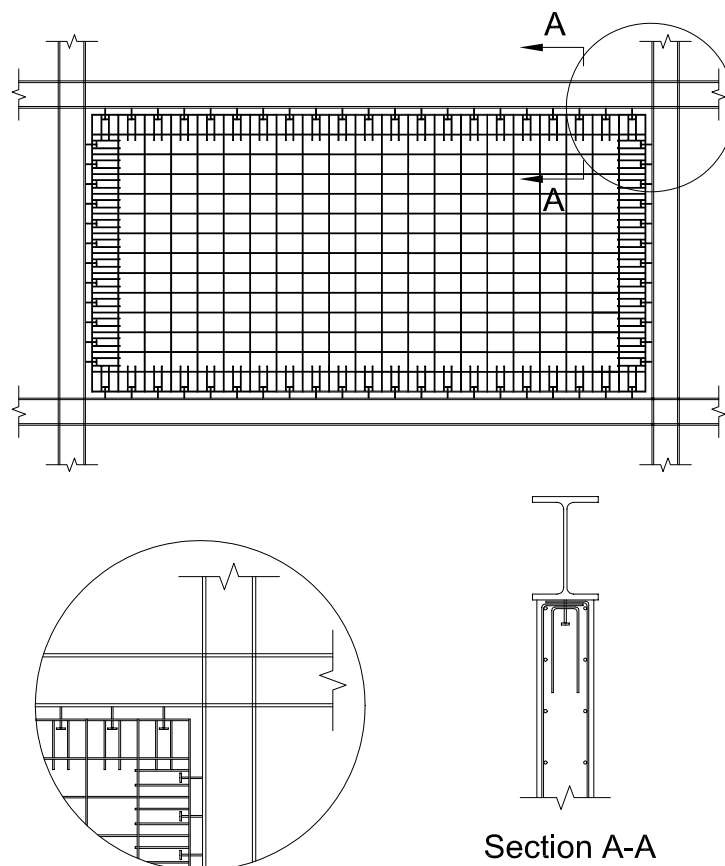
Typical reinforcement detailing in a composite wall for steel headed stud anchors subjected to tension.
